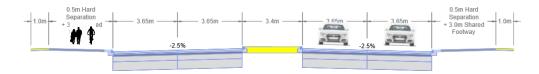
Typical section between Windmillhill roundabout and the WCML railway
